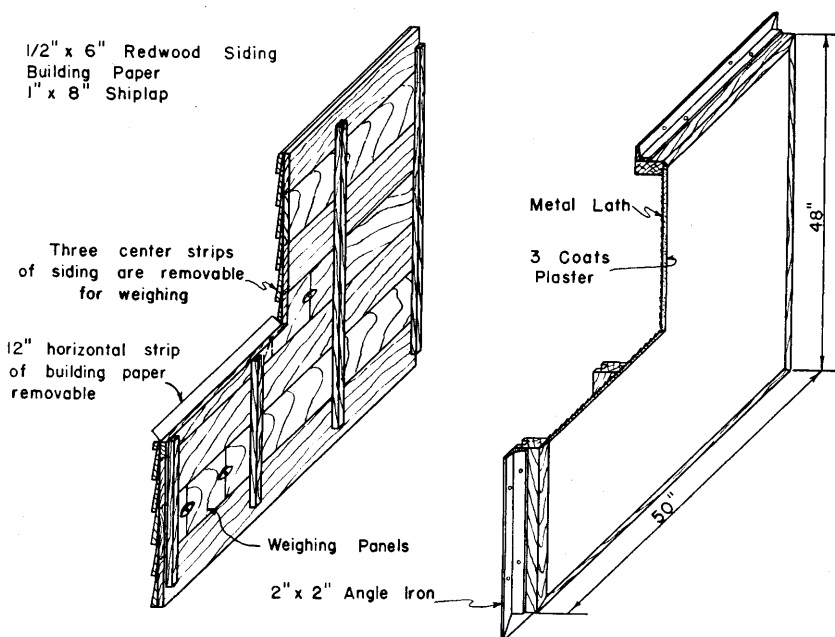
TYPE OF WALL CONSTRUCTION USED TO FACILITATE INSPECTION
